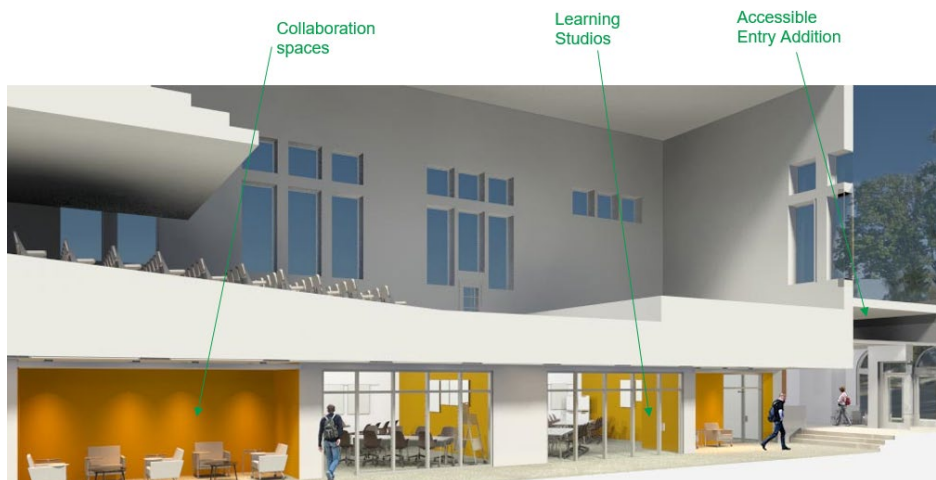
Proposed section through Glasrud Auditorium, realigned lower level and new north entrance
